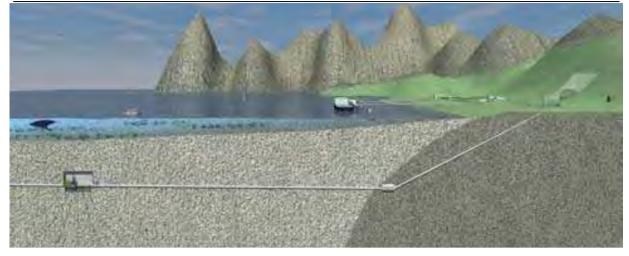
Acona concept with subsea tunnels and directional drilling from caverns
